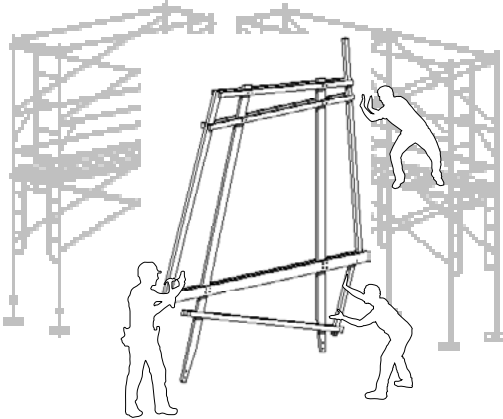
(Current and next page) Off-site manufacturing and on-site assembly of pavilions (Author, 2023).
